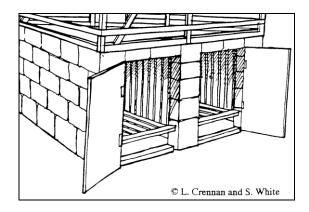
Detail of Cage-Batch – Concrete Bricks instead of Marine Ply
